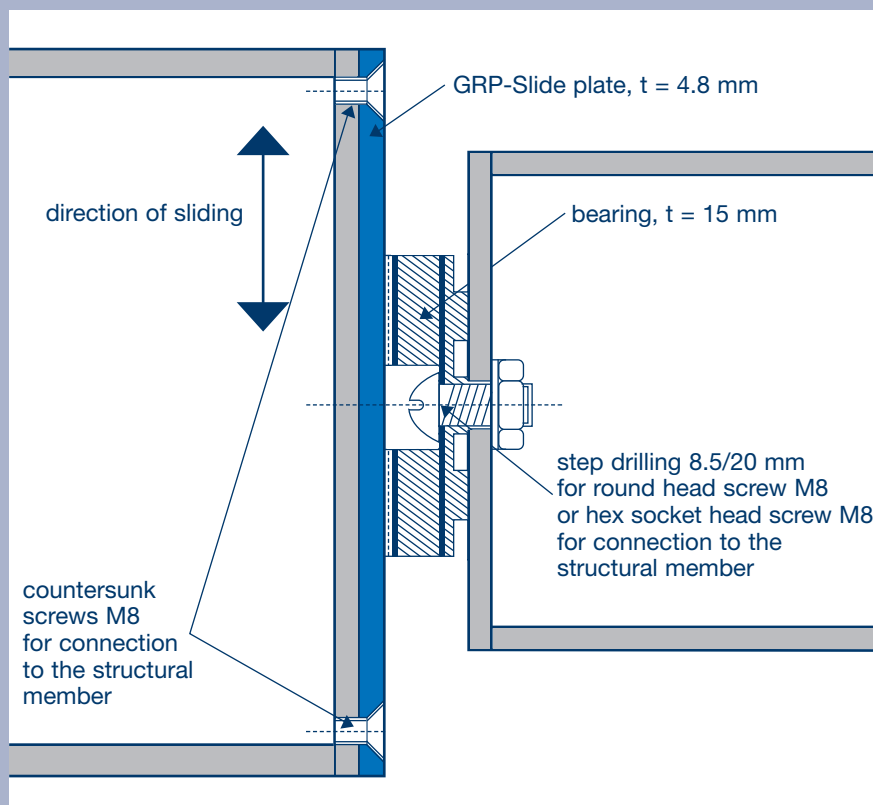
Example of a Ciparal® Sliding Bearing ST, t = 20 mm, vertical joint between two structural steel members and connection of the individual bearing components to the adjacent structural members
